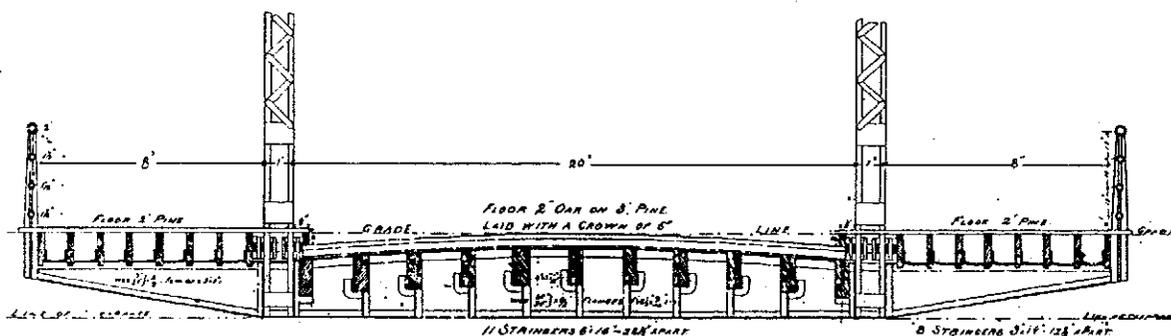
Cross section of bridge, from construction drawings by Chicago, Burlington and Quincy Railroad, 1886. Original drawings located at Galesburg, Illinois, Office of Burlington Northern Railroad.
